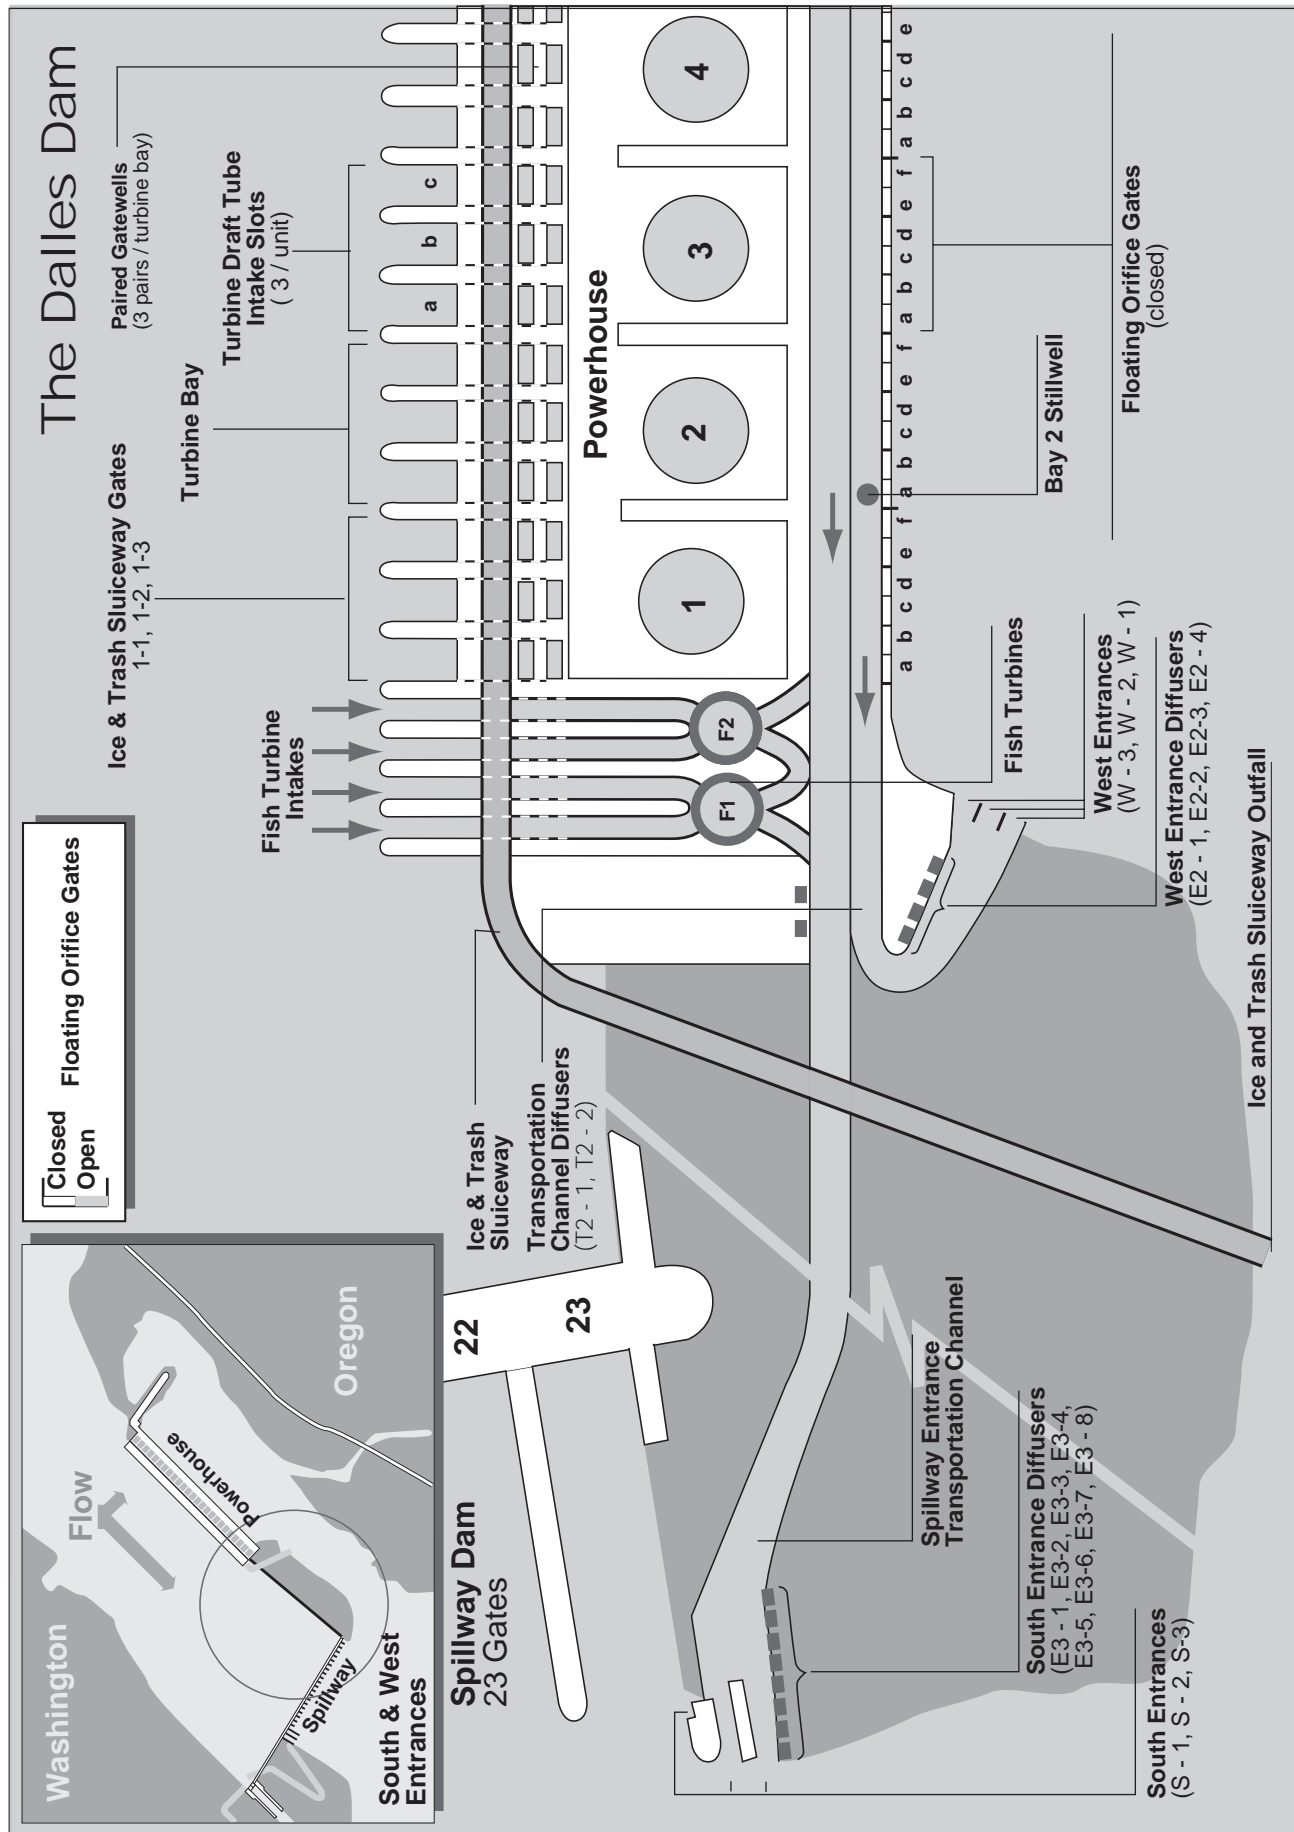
The Dalles Dam south and west fish ladder entrances.
